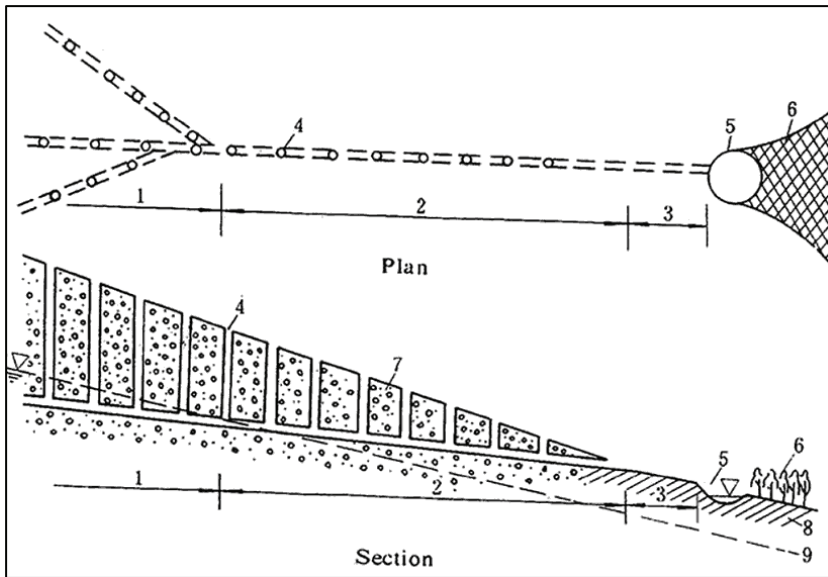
Schematic side and top views of a karez showing (1) a water harvesting underground tunnel, (2) a water-conducting underground channel, (3) an open channel, (4) vertical wells, (5) a small storage pond, (6) the irrigated area, (7) sand and gravel, (8) layers of soil, and (9) the groundwater surface.
